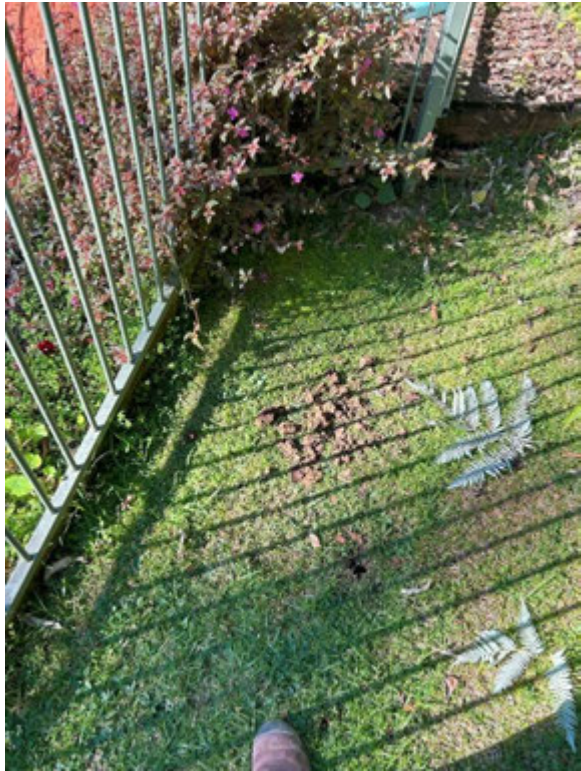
Existing Shed and Position of Proposed Retaining Wall
